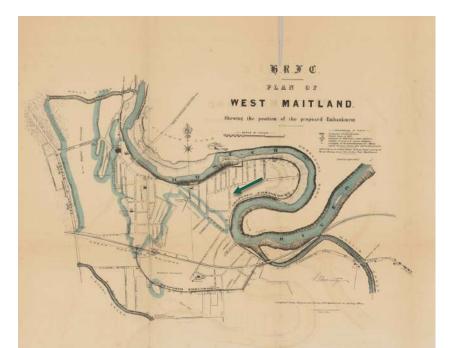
Floods in the Hunter – HRFC Plan of West Maitland showing the position of the proposed embankment.
